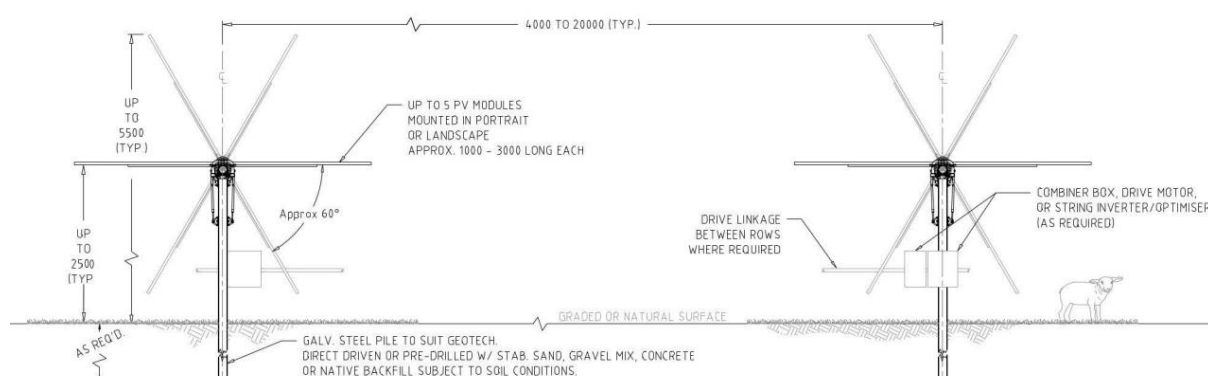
Cross-section of site with panel installation. Source: Application Documents
